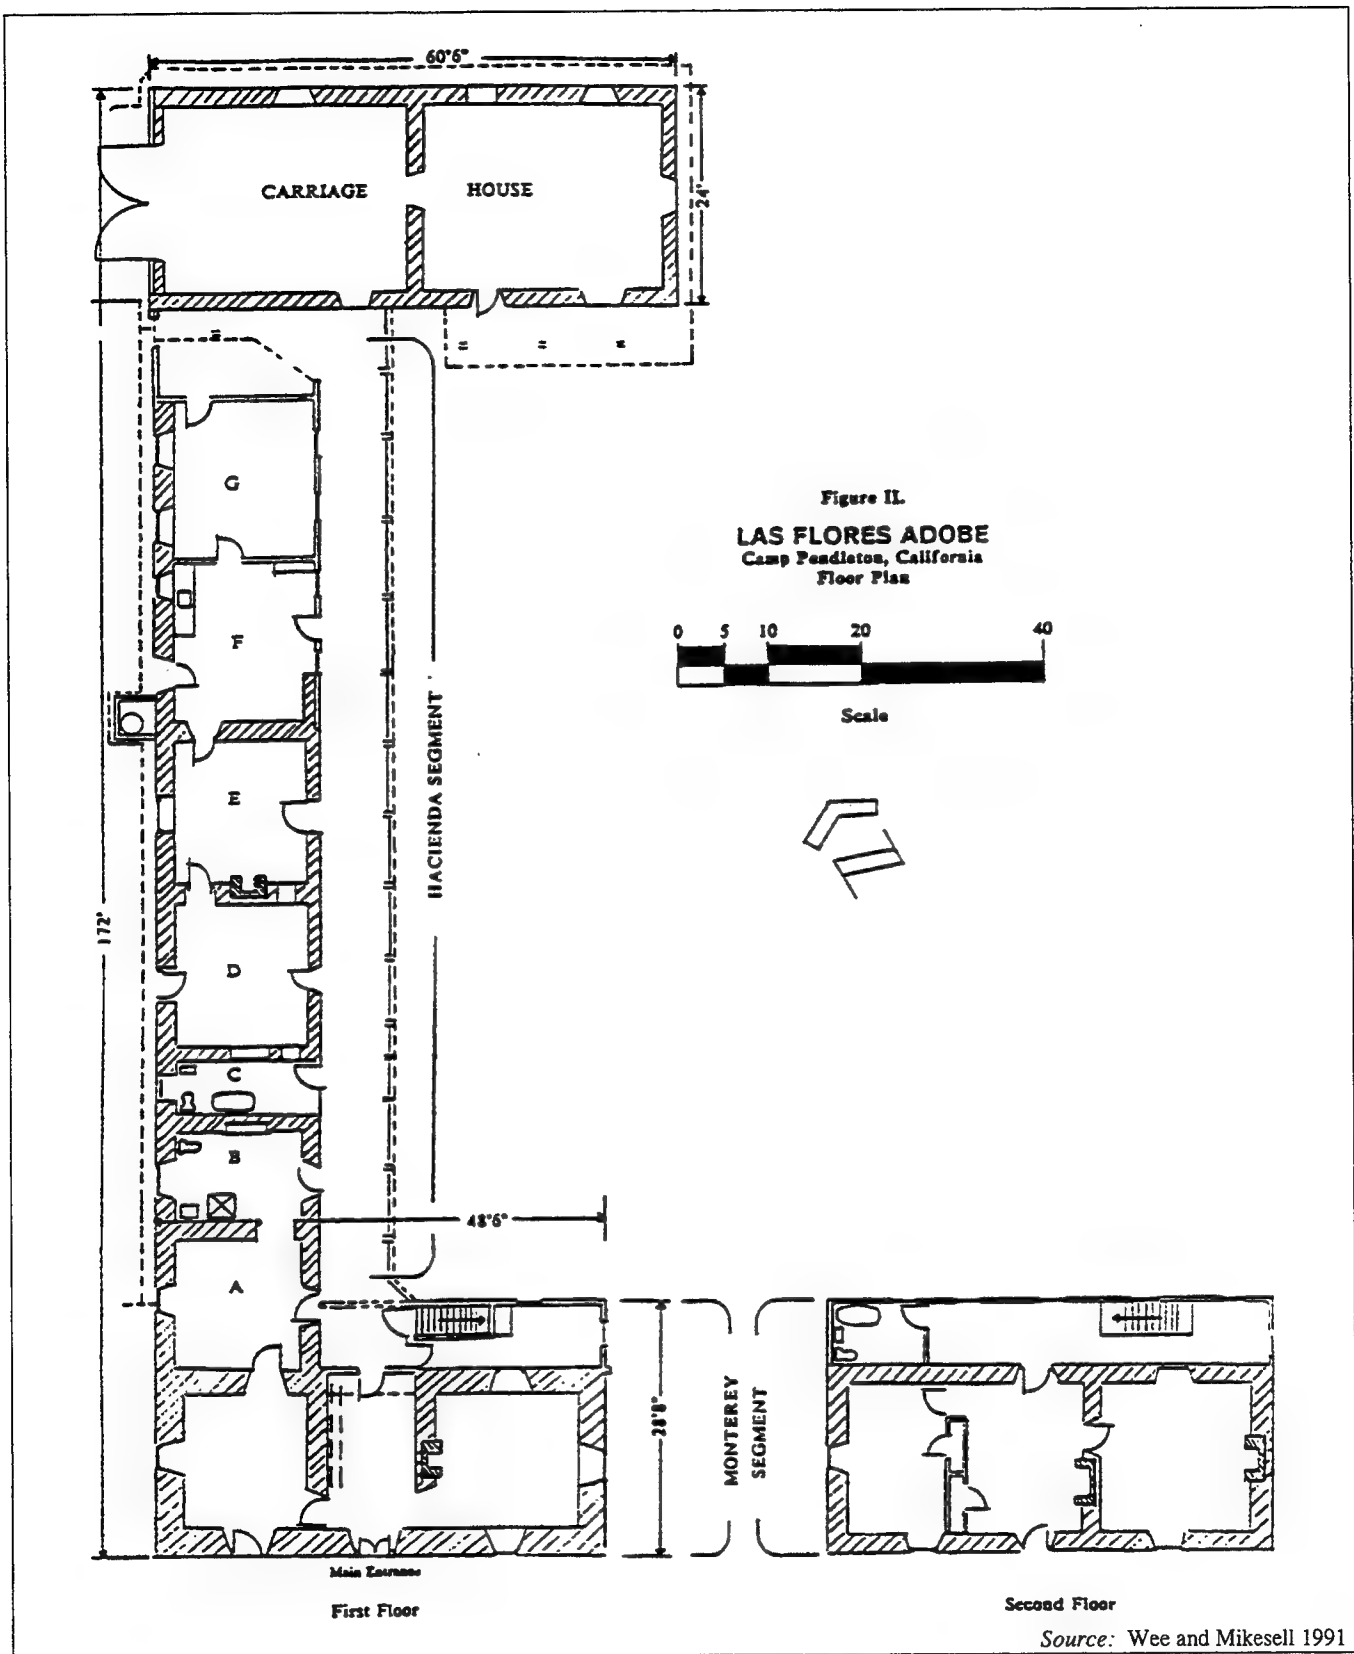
Structural Elements of the Las Flores Adobe Ranch House
